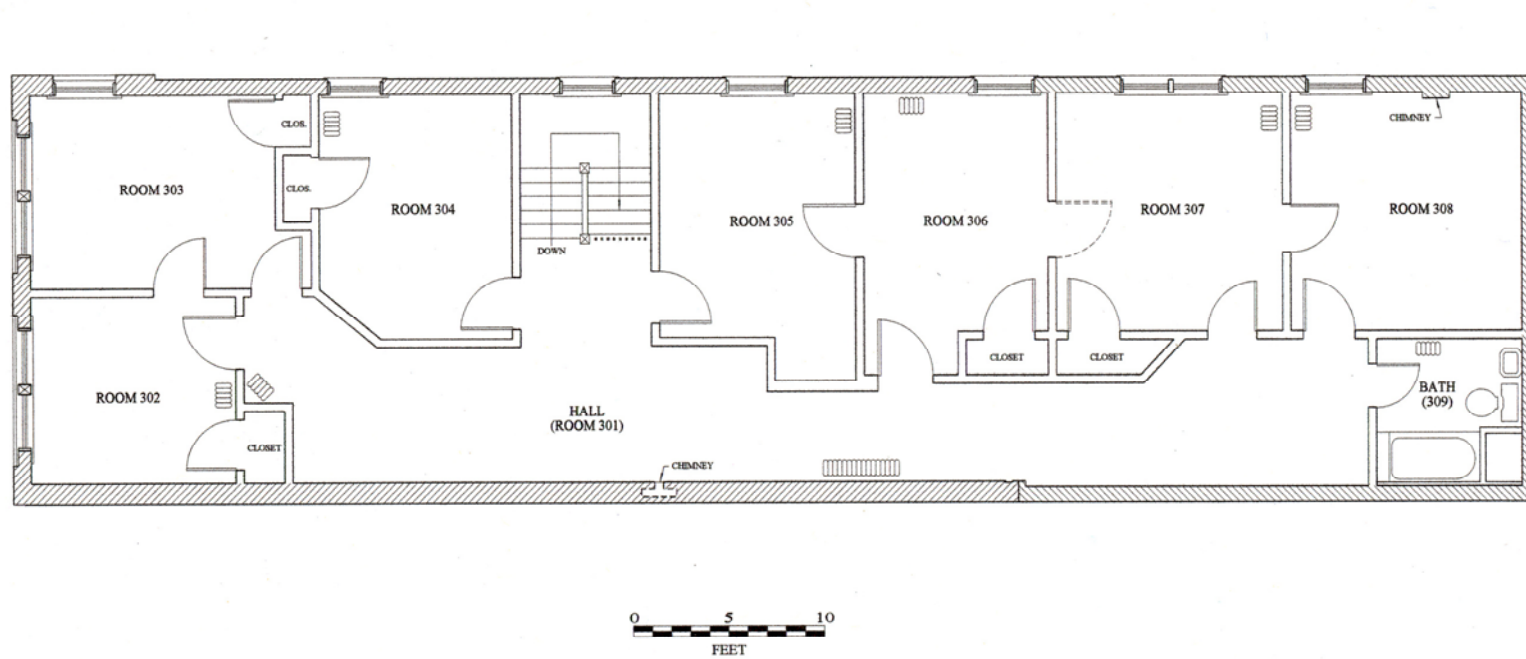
Third floor plan of the Coney Island Building, showing conditions in 2000.
